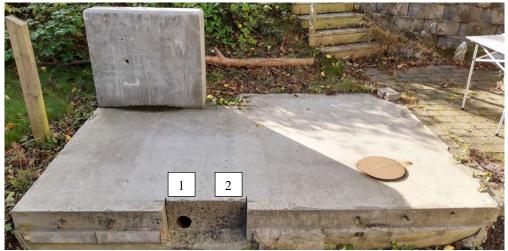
Slab. 1) Empty duct. 2) Fully grouted duct
